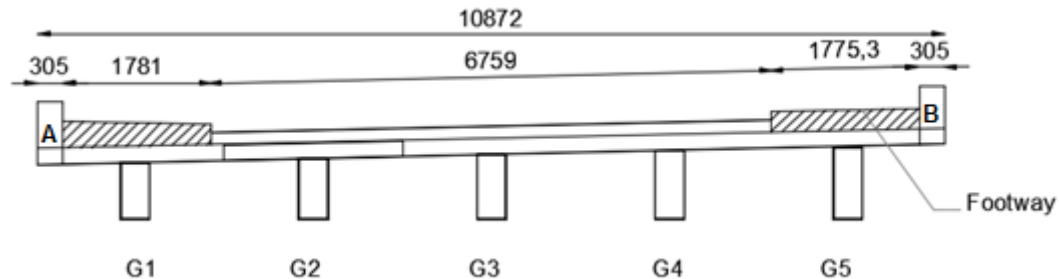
Schematic representation of the deck slab supported in the girders (dimensions in mm)
